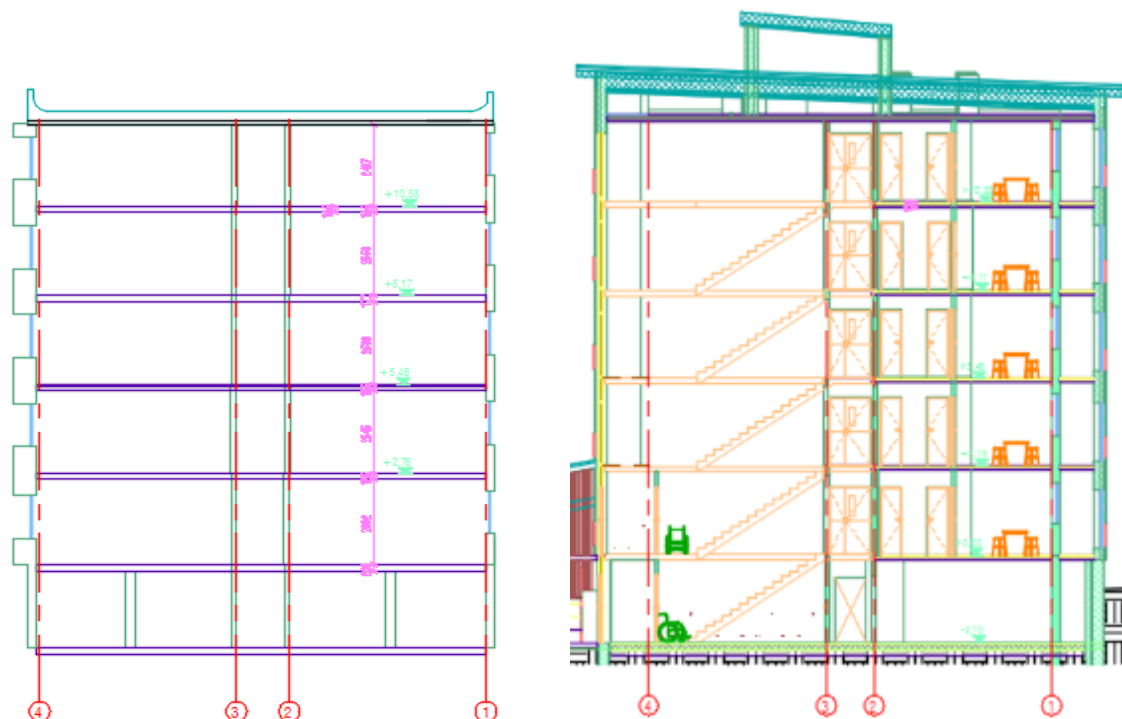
Cross section of the pilot building before (left) and after (right) nZEB renovation
